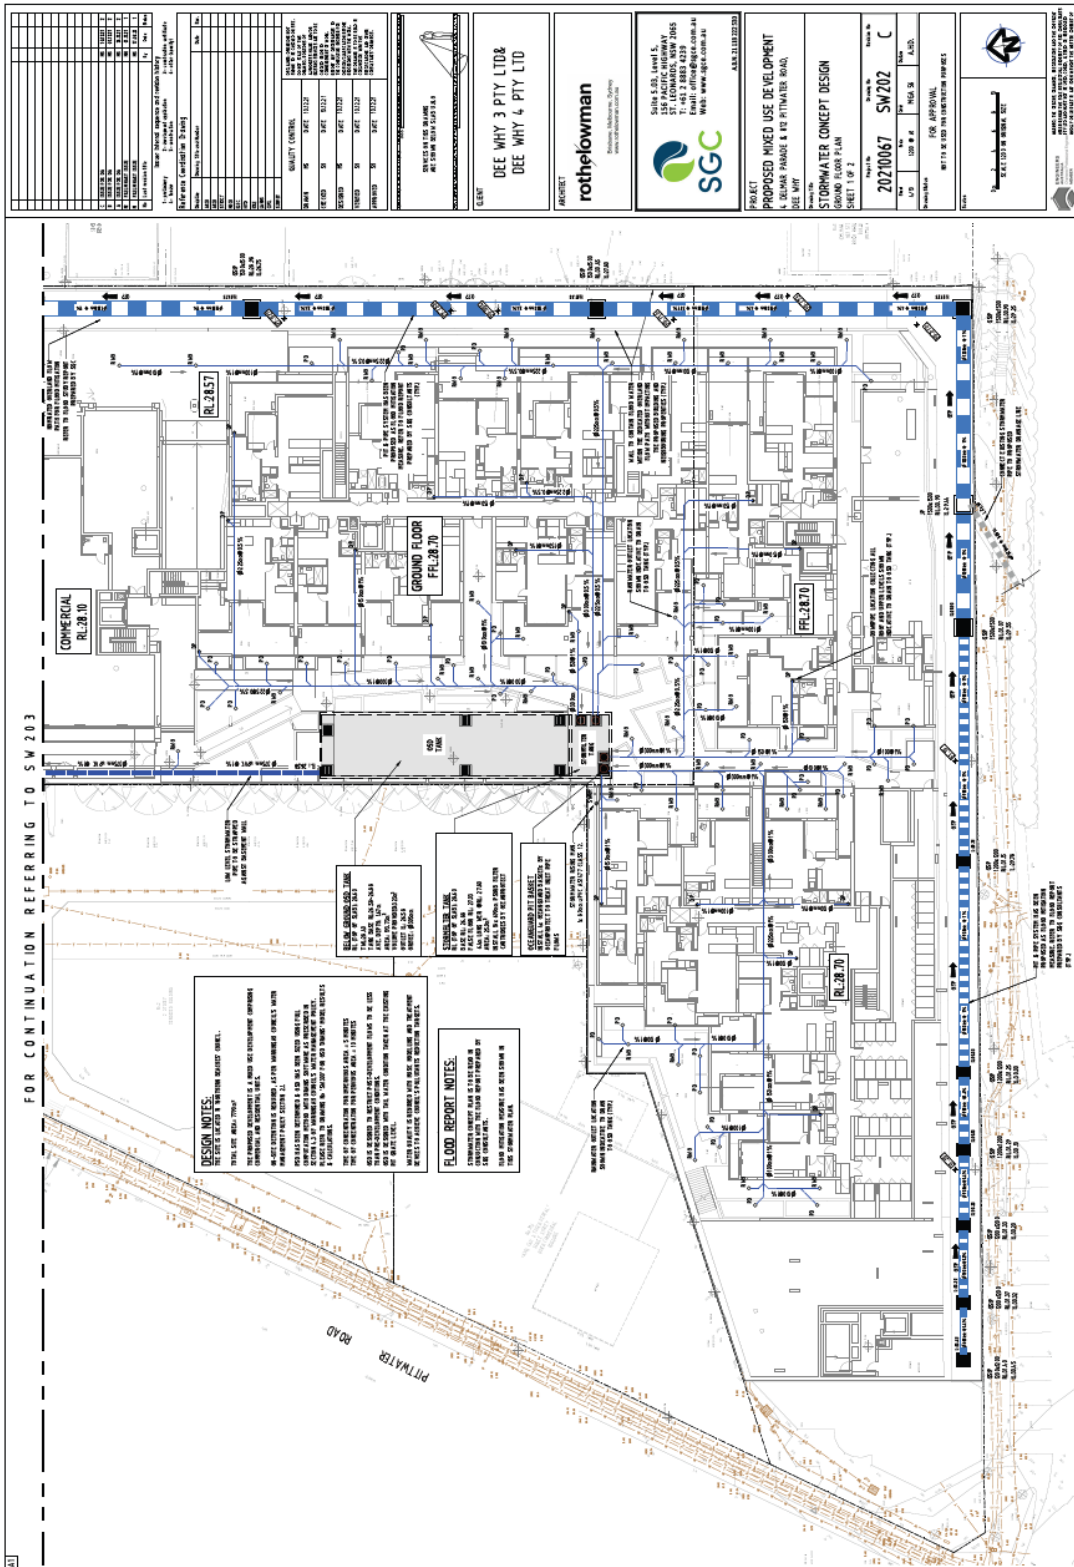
Ground Floor Stormwater Concept Plan Part 1 by SGC
